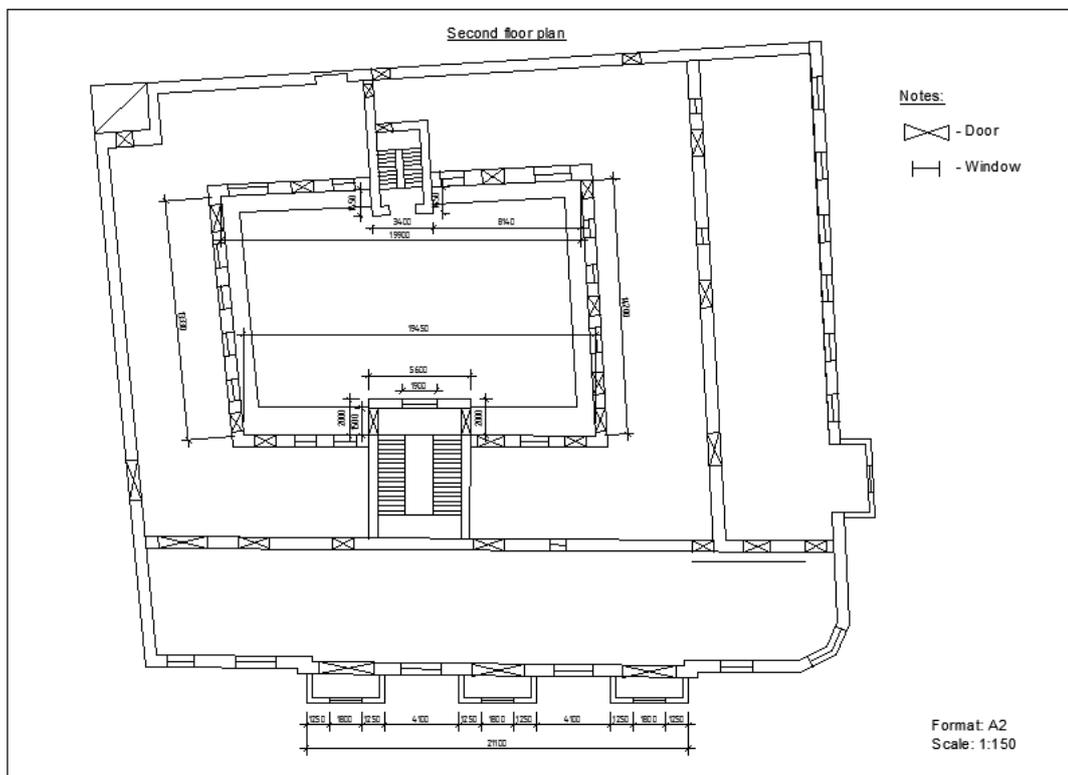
Sample of the walls and openings plan of typical floor (new drawing)
